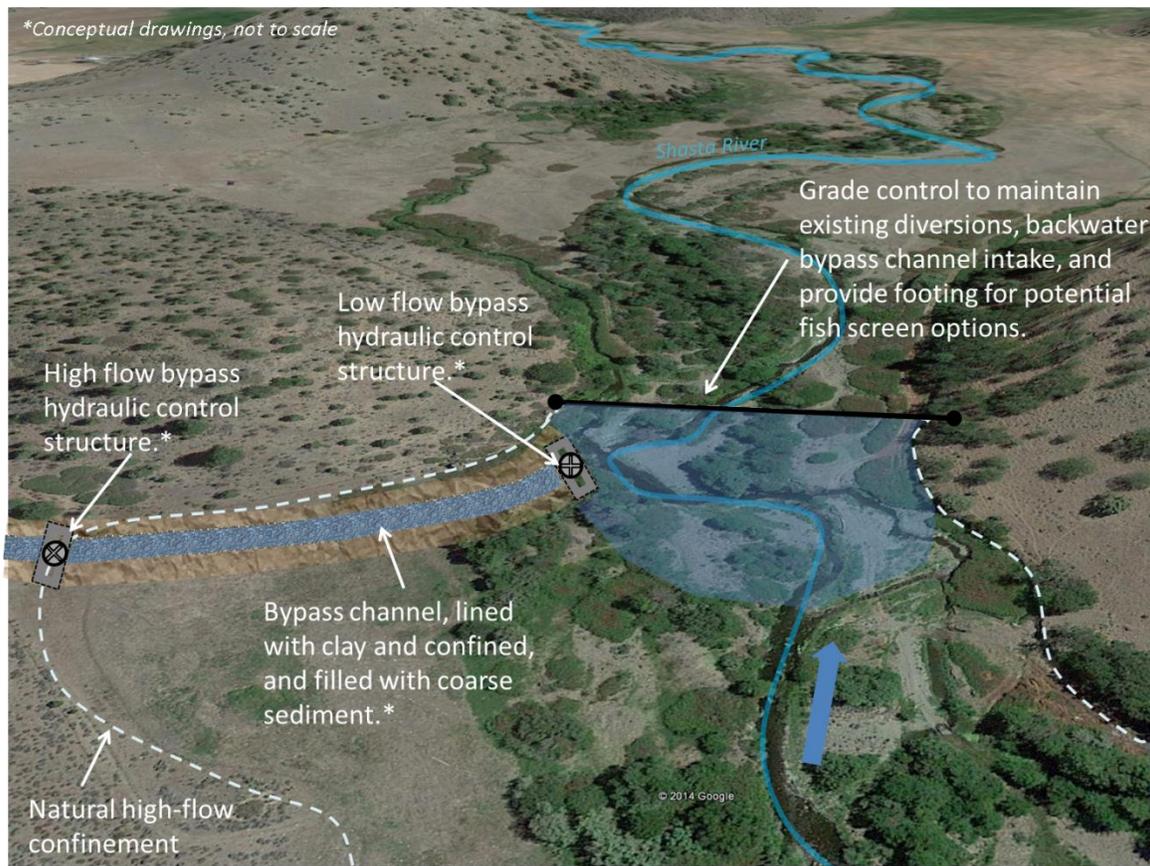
Conceptual drawing of the proposed bypass channel entrance (for Route D) at the Slough Road location.
